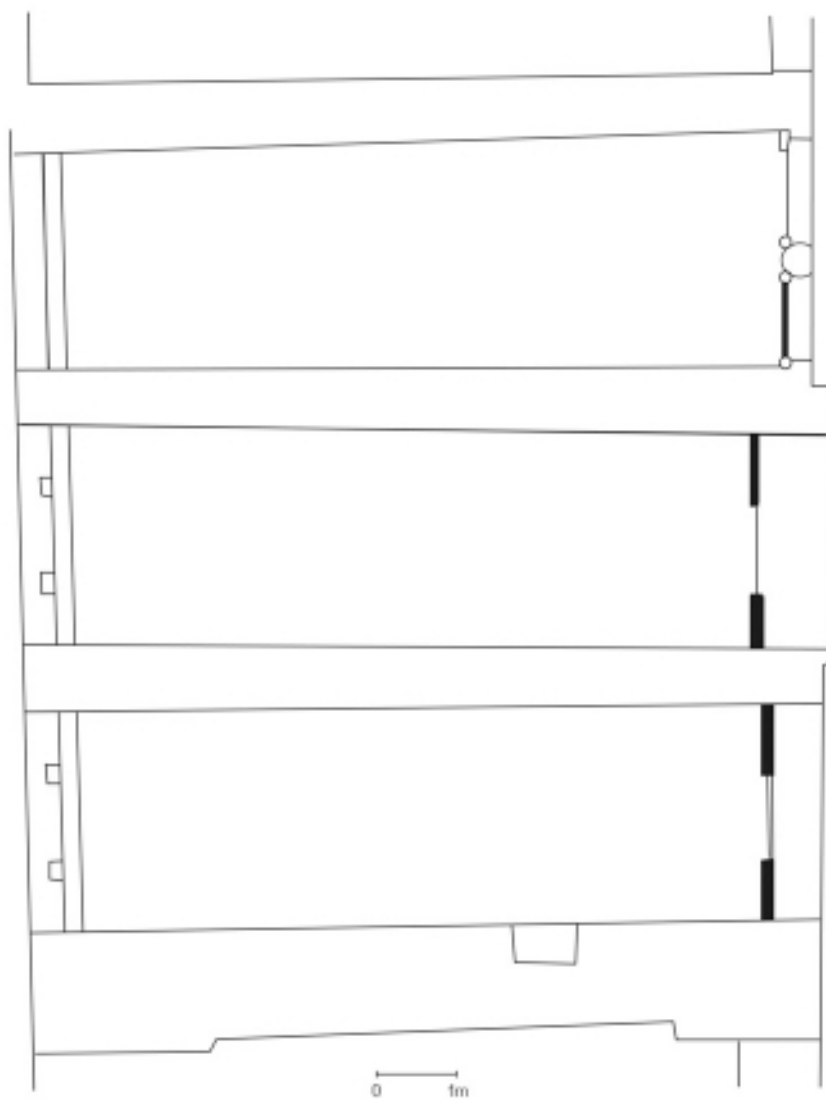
Plan of house with three ground-floor shops in Jerusalem (House 8:2) (drawing by author).
